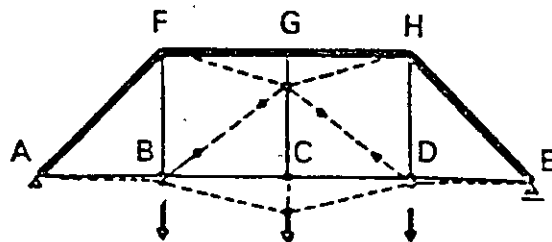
Balance of forces in the multi-span Pratt truss
